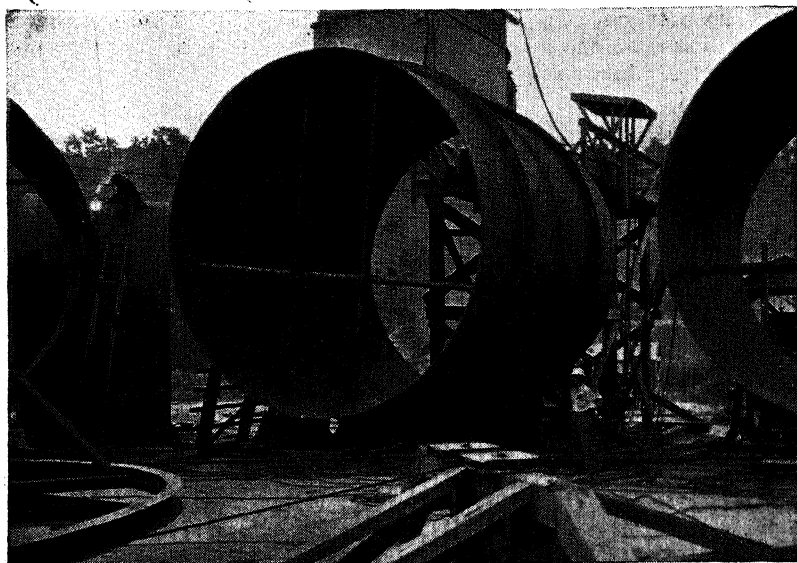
Sections of 20-foot diameter penstock fabricated by automatic shielded carbon arc welding in the field.
